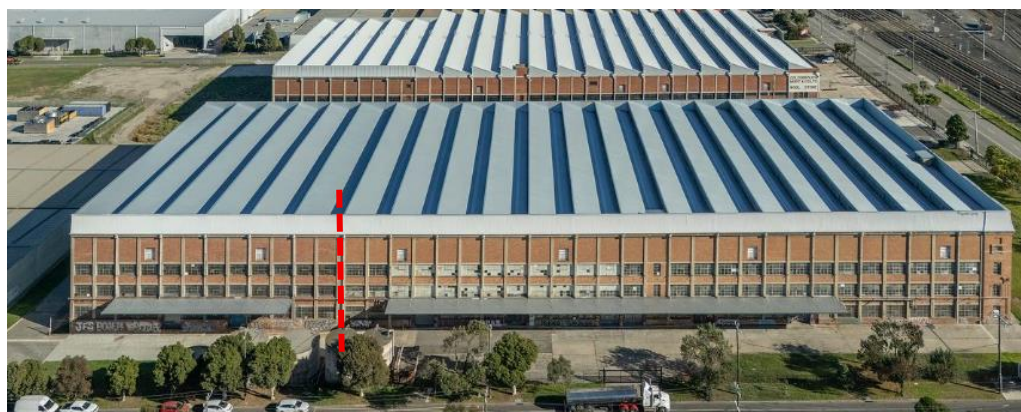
Aerial of the existing building, looking towards the eastern elevation. Left of the red dash line is the extent of the 1960s extension.
